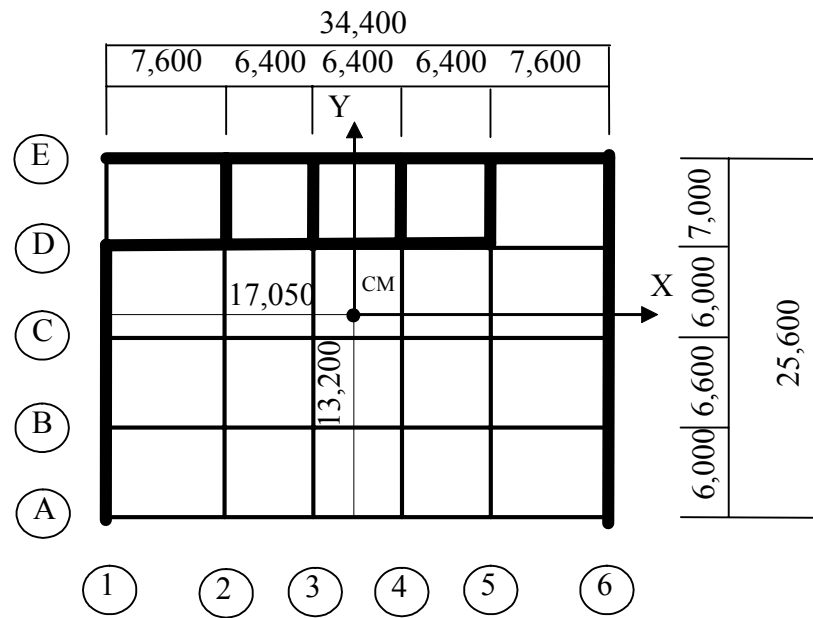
Plan of 9-Story Asymmetric Building.
